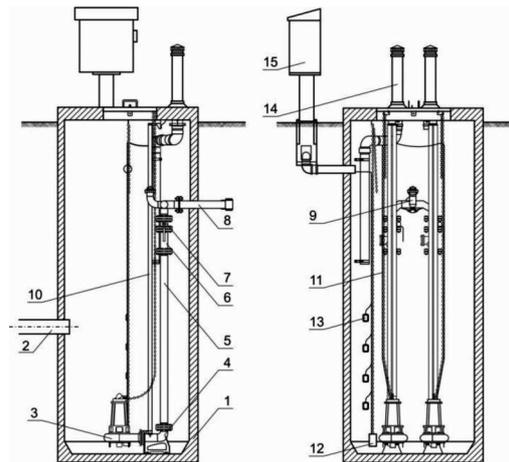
Rainwater pumping plant made of polymer concrete PB, concrete BT or prestressed concrete BS; 1 – reservoir, 2 – duct for incoming sewage, 3 – immersion pump, 4 – coupling foot, 5 – pumping pipeline, 6 – check valve, 7 – cut-off valve, 8 – sewage disposal pipe, 9 – installation flushing connection, 10 – pipe guides, 11 – chains for lowering and lifting of pumps, 12 – weighted chain, 13 – floating switch, 14 – venting installation, 15 – control cabinet [6]
